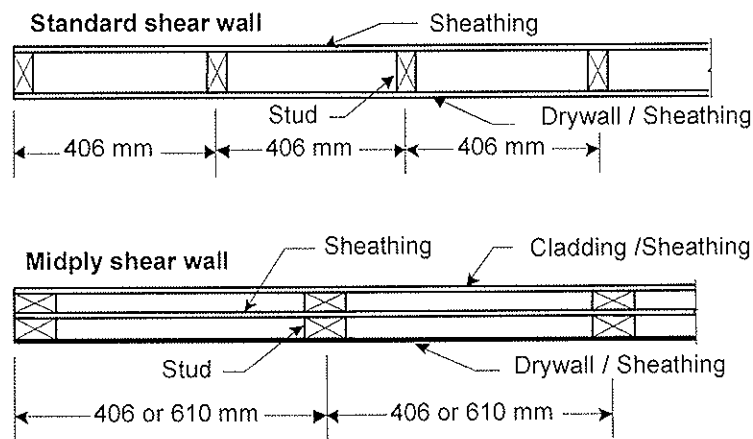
Cross-section of a standard shearwall (top) and a midply wall (bottom) with two exterior panels
